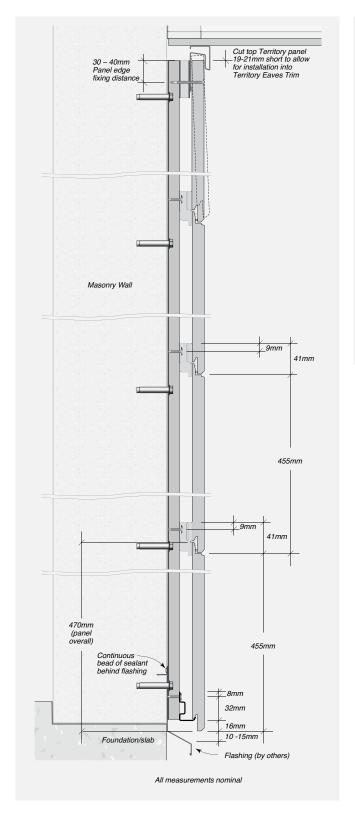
Typical Territory System Cross Sectional Detail for Masonry substrate where face fixing is required - Elevation
